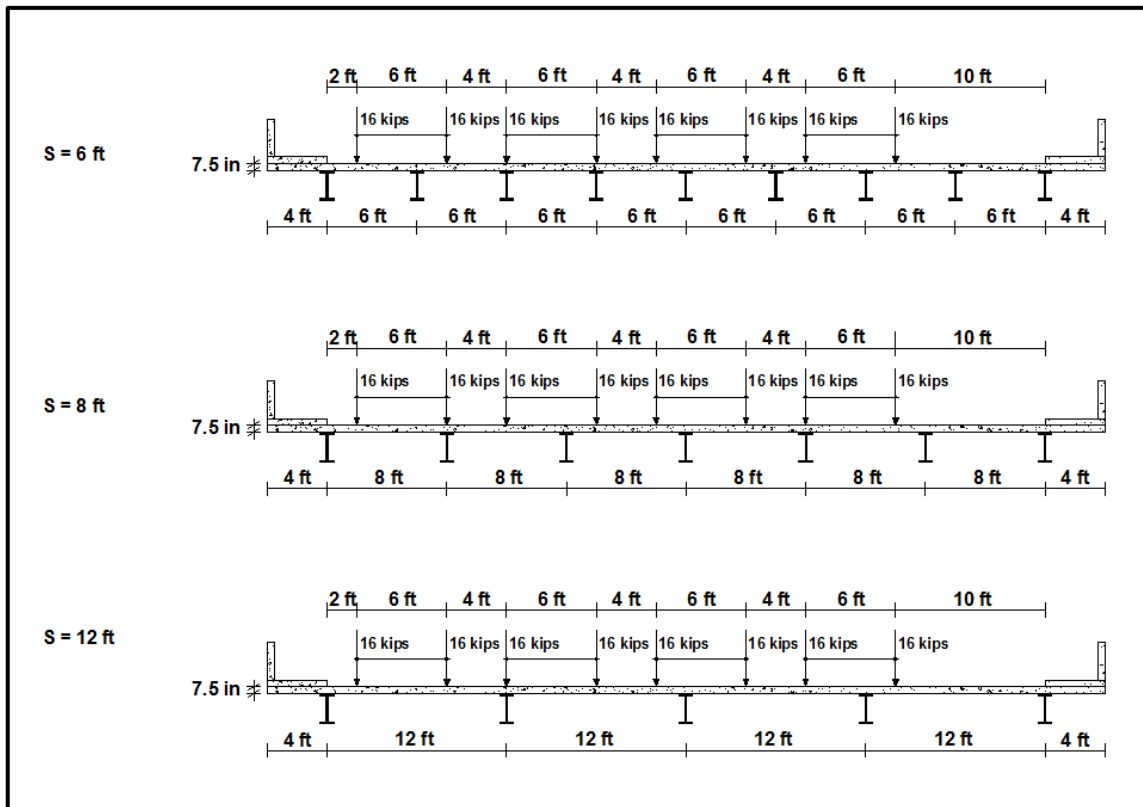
Typical Cross-Section of Four-Lane Bridges (Case 2SR) and The Critical Transverse Position of HS20 Trucks for the different Girder Spacing Considered (Nuwayhid et al. 2015)
